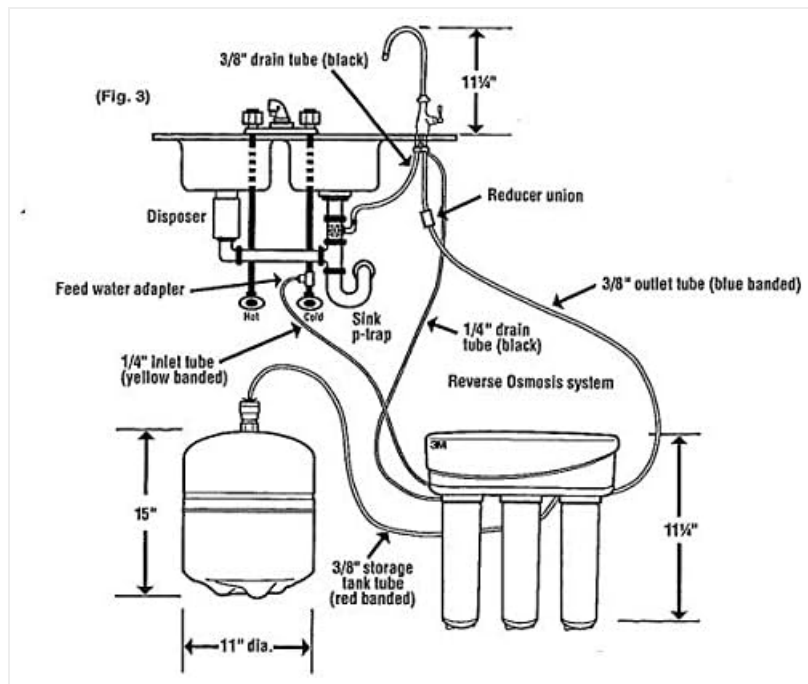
Detailed installation diagram showing component placement and tubing connections for the 3M 4US-RO-S01H system.
